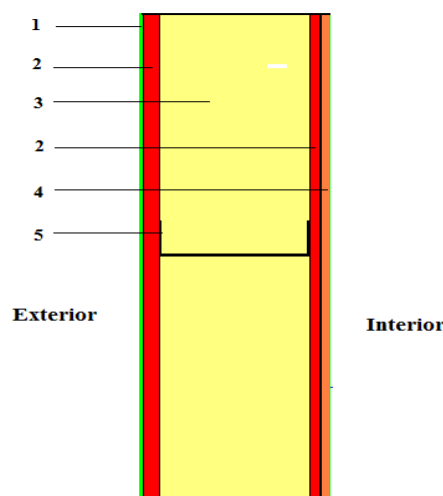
The scheme of a fragment of the steel framed wall without thermal breaks. Materials: 1 – exterior plaster; 2 – oriented strand board (OSB); 3 – thermal insulation; 4 – interior plaster board; 5 – steel stud.
